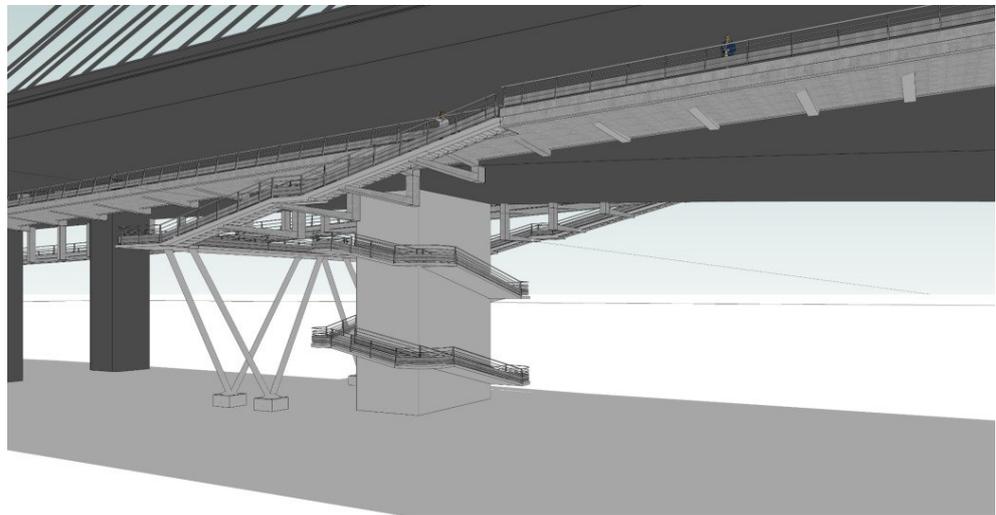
Schematic of the pedestrian stairways and access structures of the Zhongxing bridge
